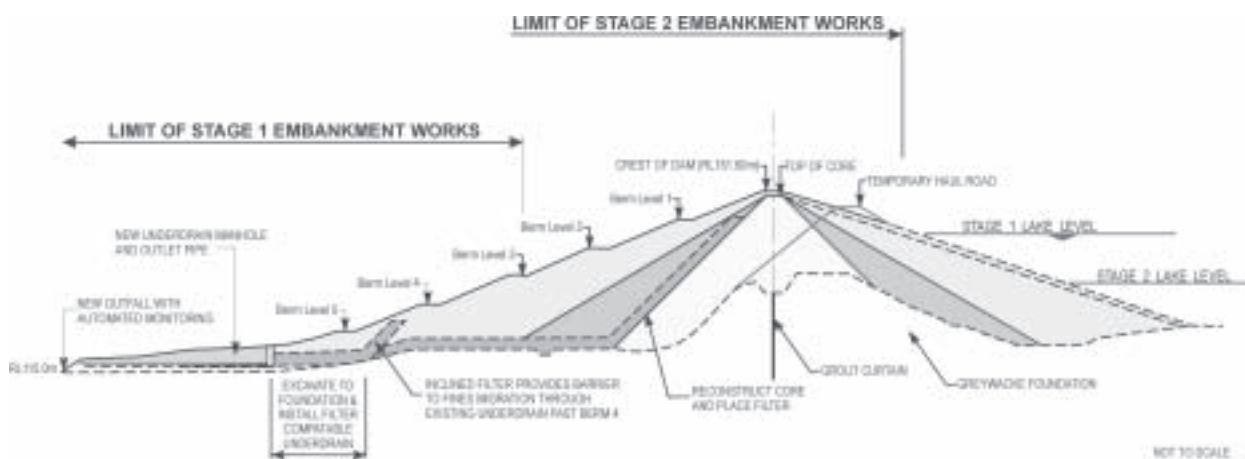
Section through Cosseys Dam, near Papakura, Auckland, showing construction stages for upgrade.
